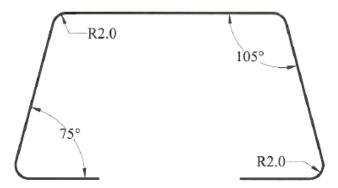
Typical Cross Section for Folded Plate Bridge System [8]
